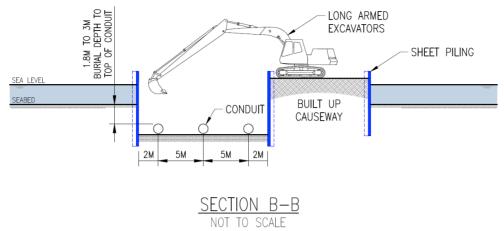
Temporary Works – Cofferdam and Causeway Construction
